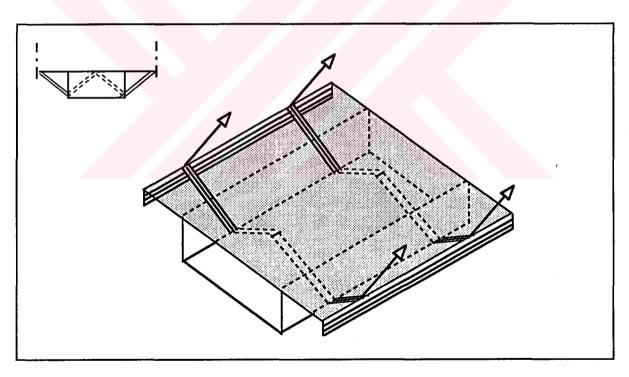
CONNECTION BETWEEN A CENTRAL BOX GIRDER AND MONO-STRAND STAY CABLES
